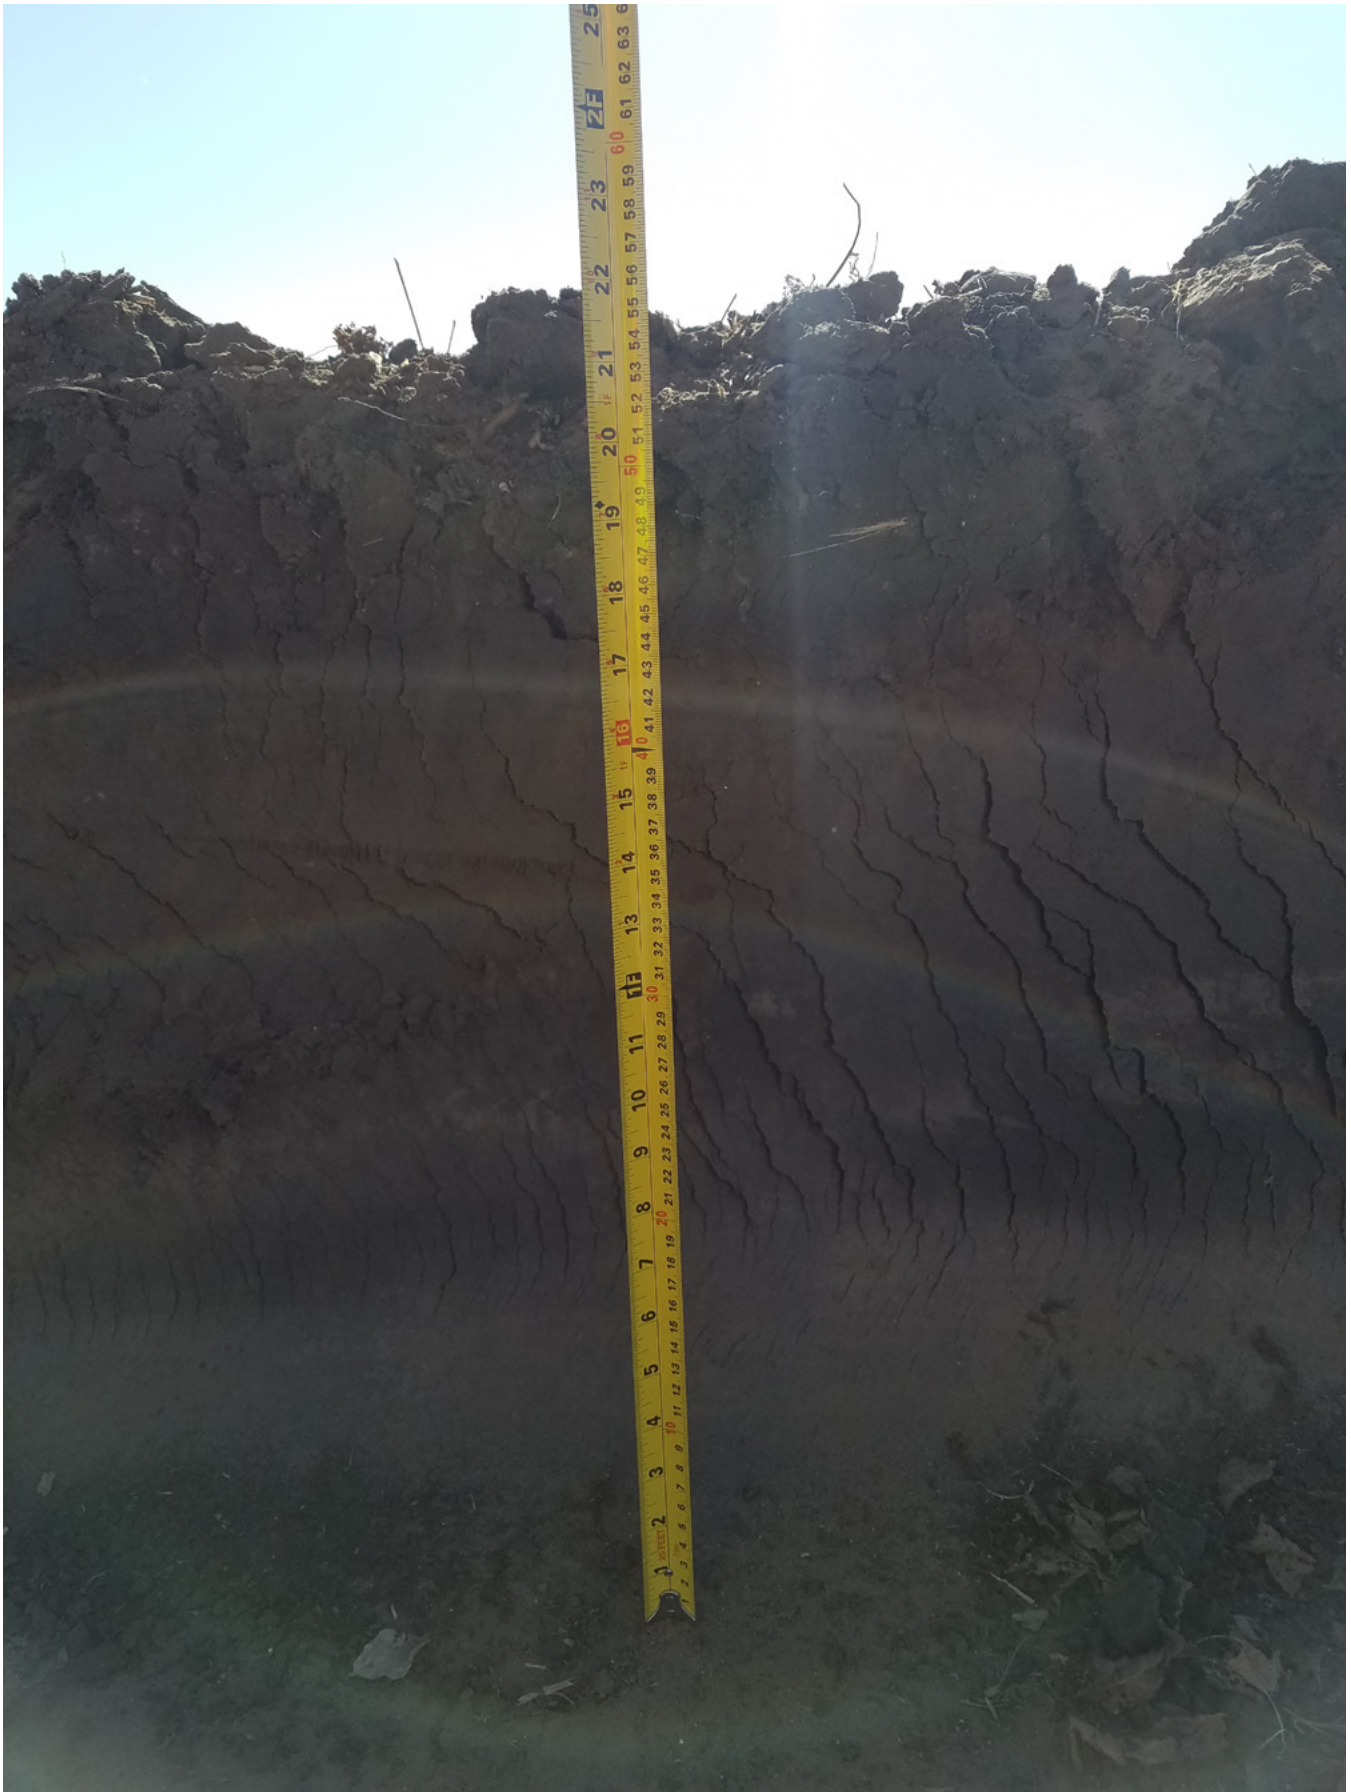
22" topsoil depth looking east on the north side of the approach on the west edge of concrete pad
